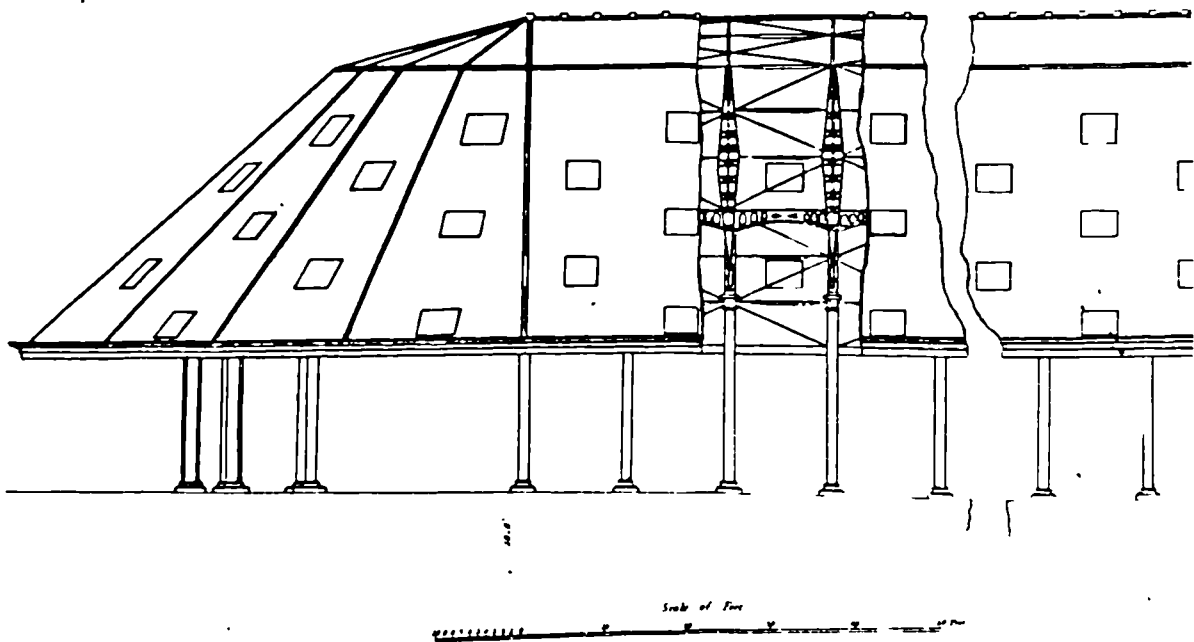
Slip Roof Nos. 8 & 9, Pembroke, 1844-45 :
